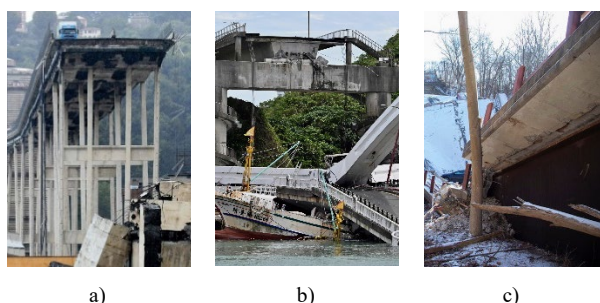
Recent collapses of reinforced concrete bridges due to the corrosion of steel: a) Igaly (Genova), b) Taiwan, c) USA (Pittsburgh).
